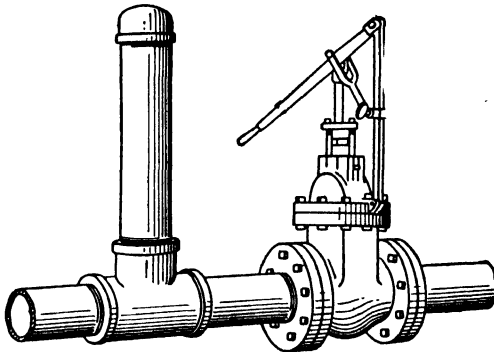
An air chamber installed ahead of quick-opening valves reduces water hammer. (Courtesy of The Wm. Powell Co.)
